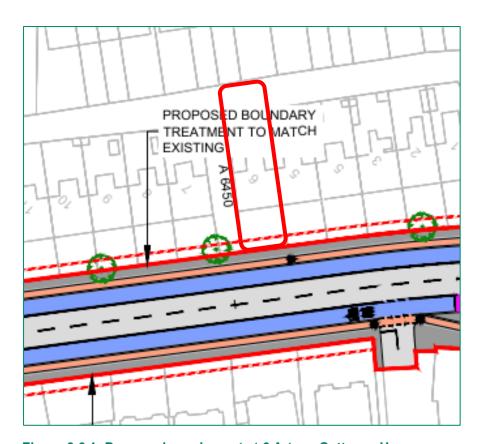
Proposed new Layout at 6 Artane Cottages Upper
